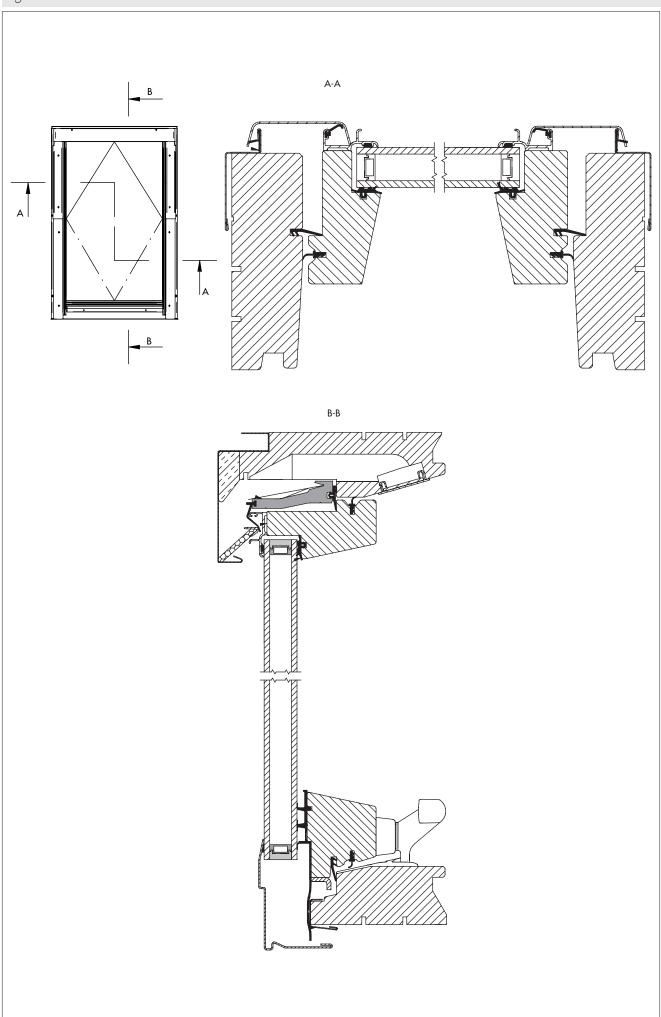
FTP-V L3 Centre Pivot Roof Window cross sections
